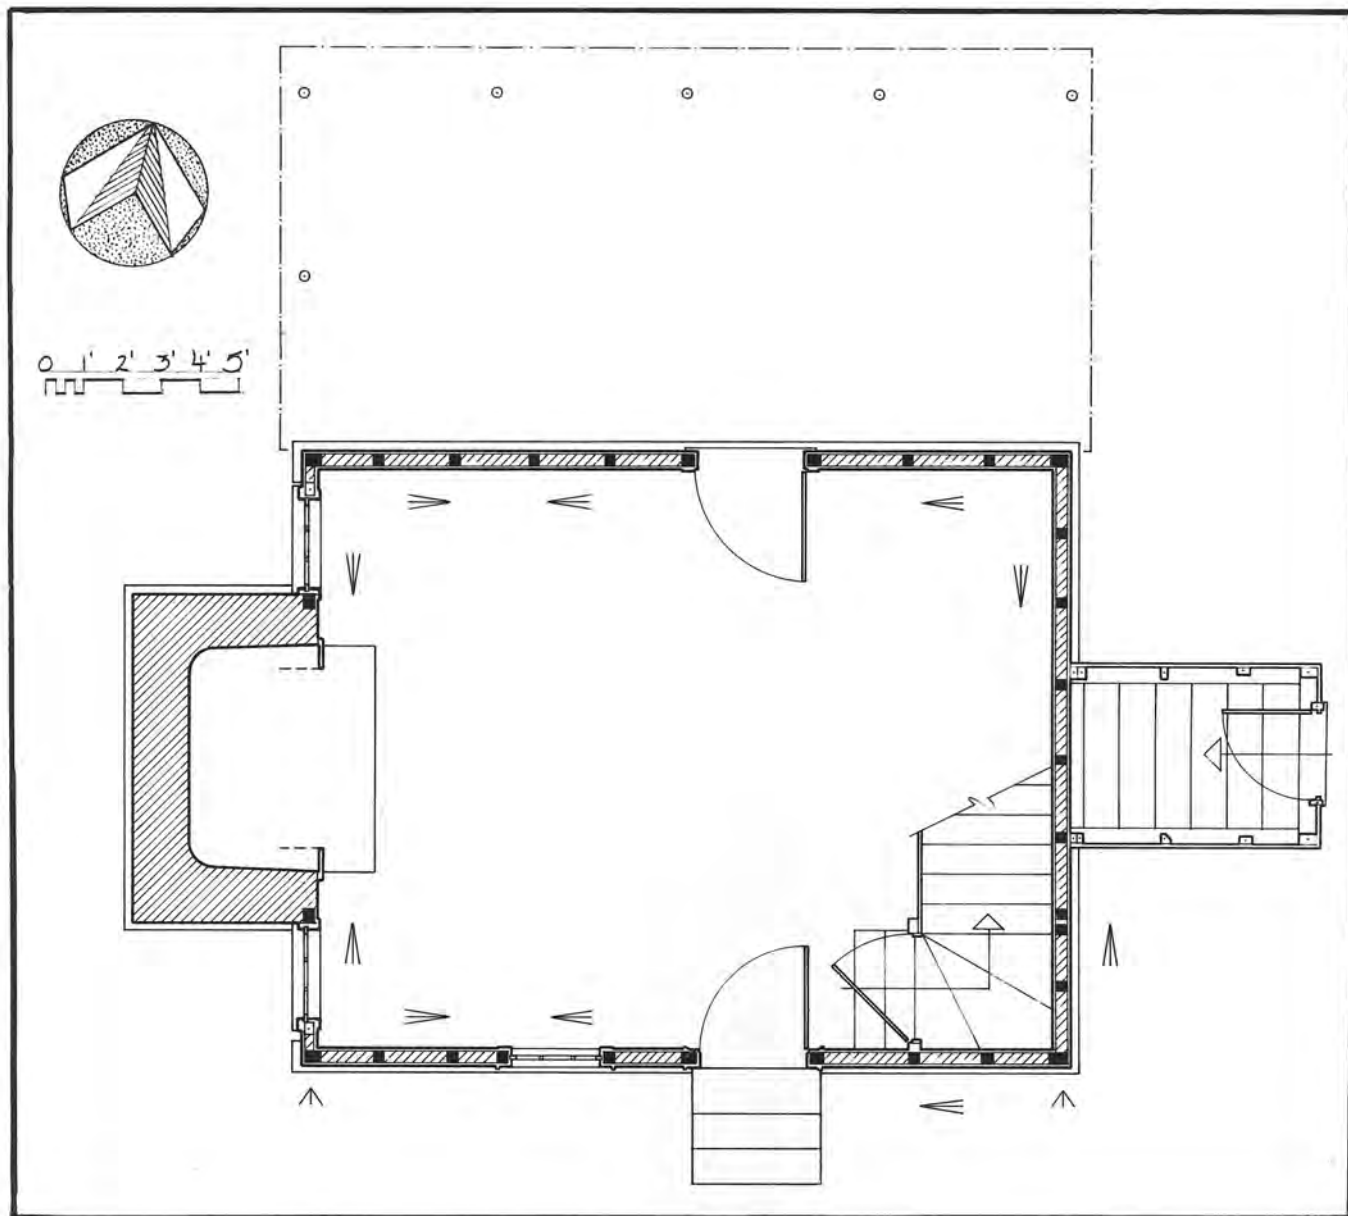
Rochester House, first-floor plan. Delineator: Willie Graham, Colonial Williamsburg.
